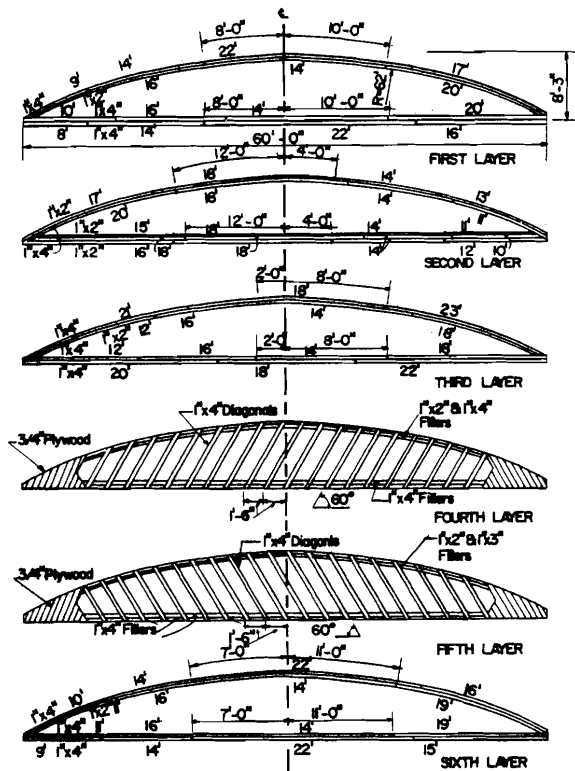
Layout of layers 1 to 6 in segmental latticed roof trusses.
